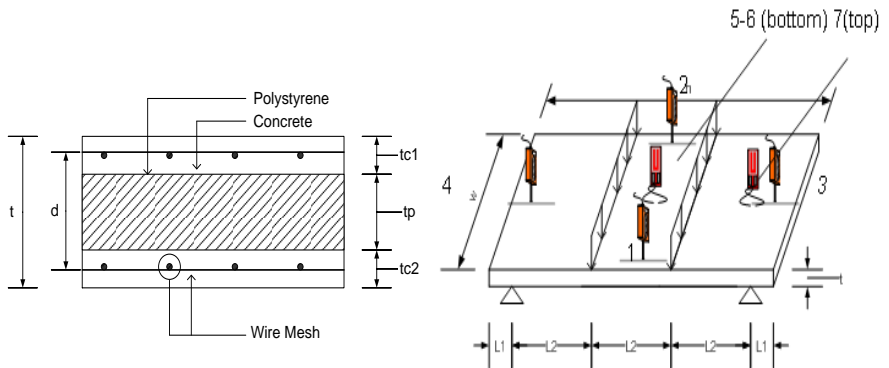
Test No 1- Bending Test Setup and Cross Section Details
